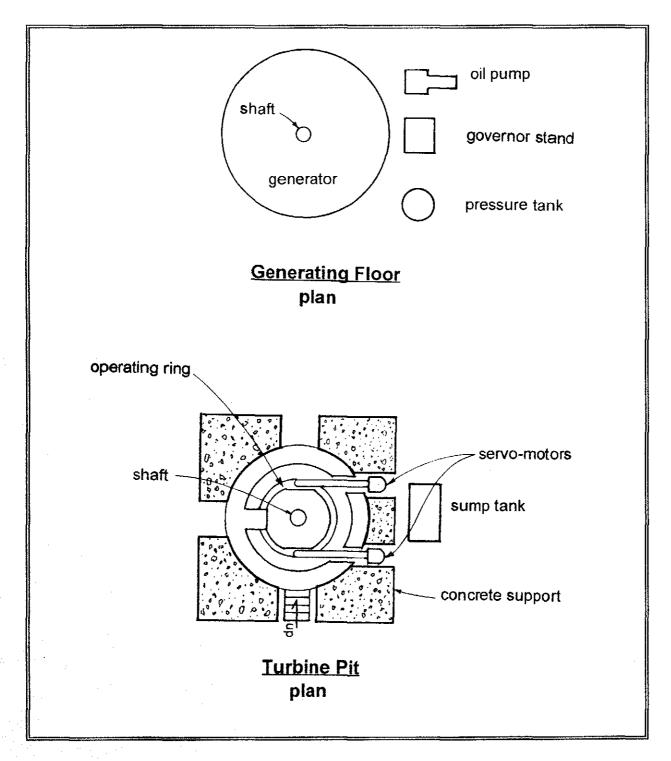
Plans Showing the Layout of Governance Equipment for a Turbine-Generator Unit.
